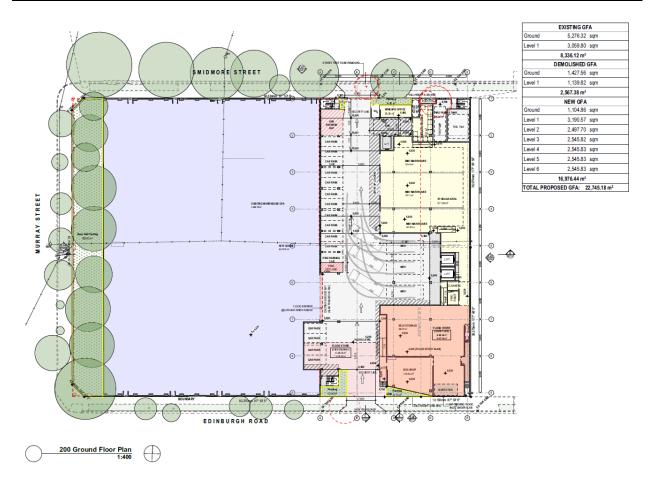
Concept Ground Floor Plan - Indicating deep soil area along western boundary
